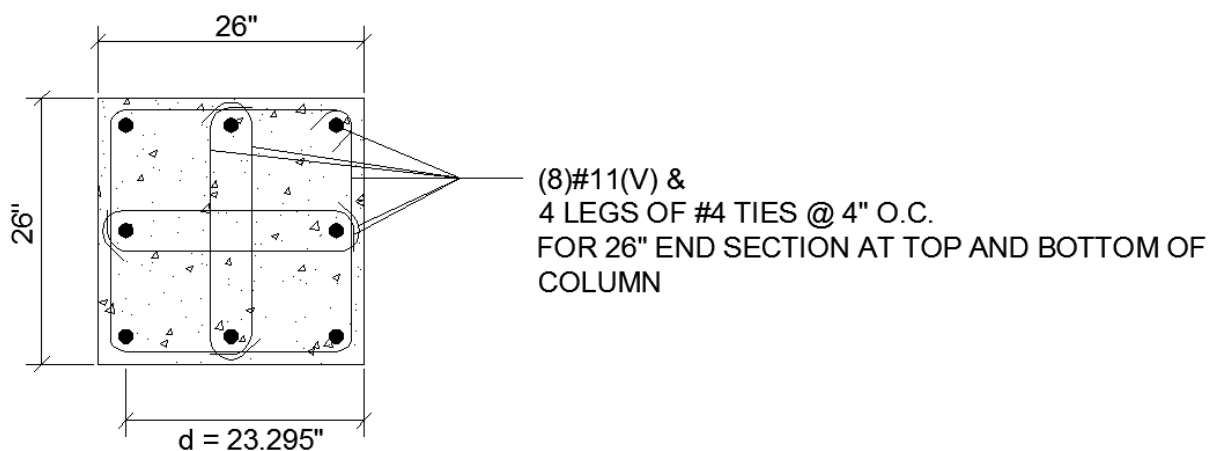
Exterior column cross-section at end of column at ground floor level based on tsunami design requirements
